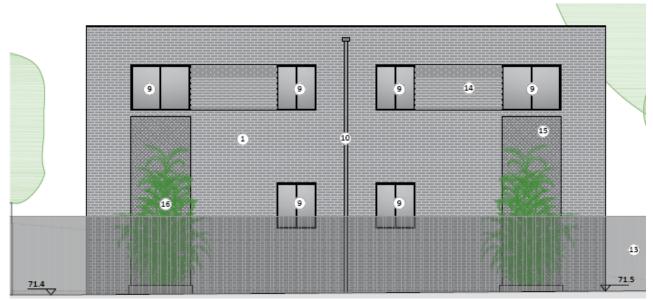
Refused rear elevation of planning application 16/00018/FUL.
